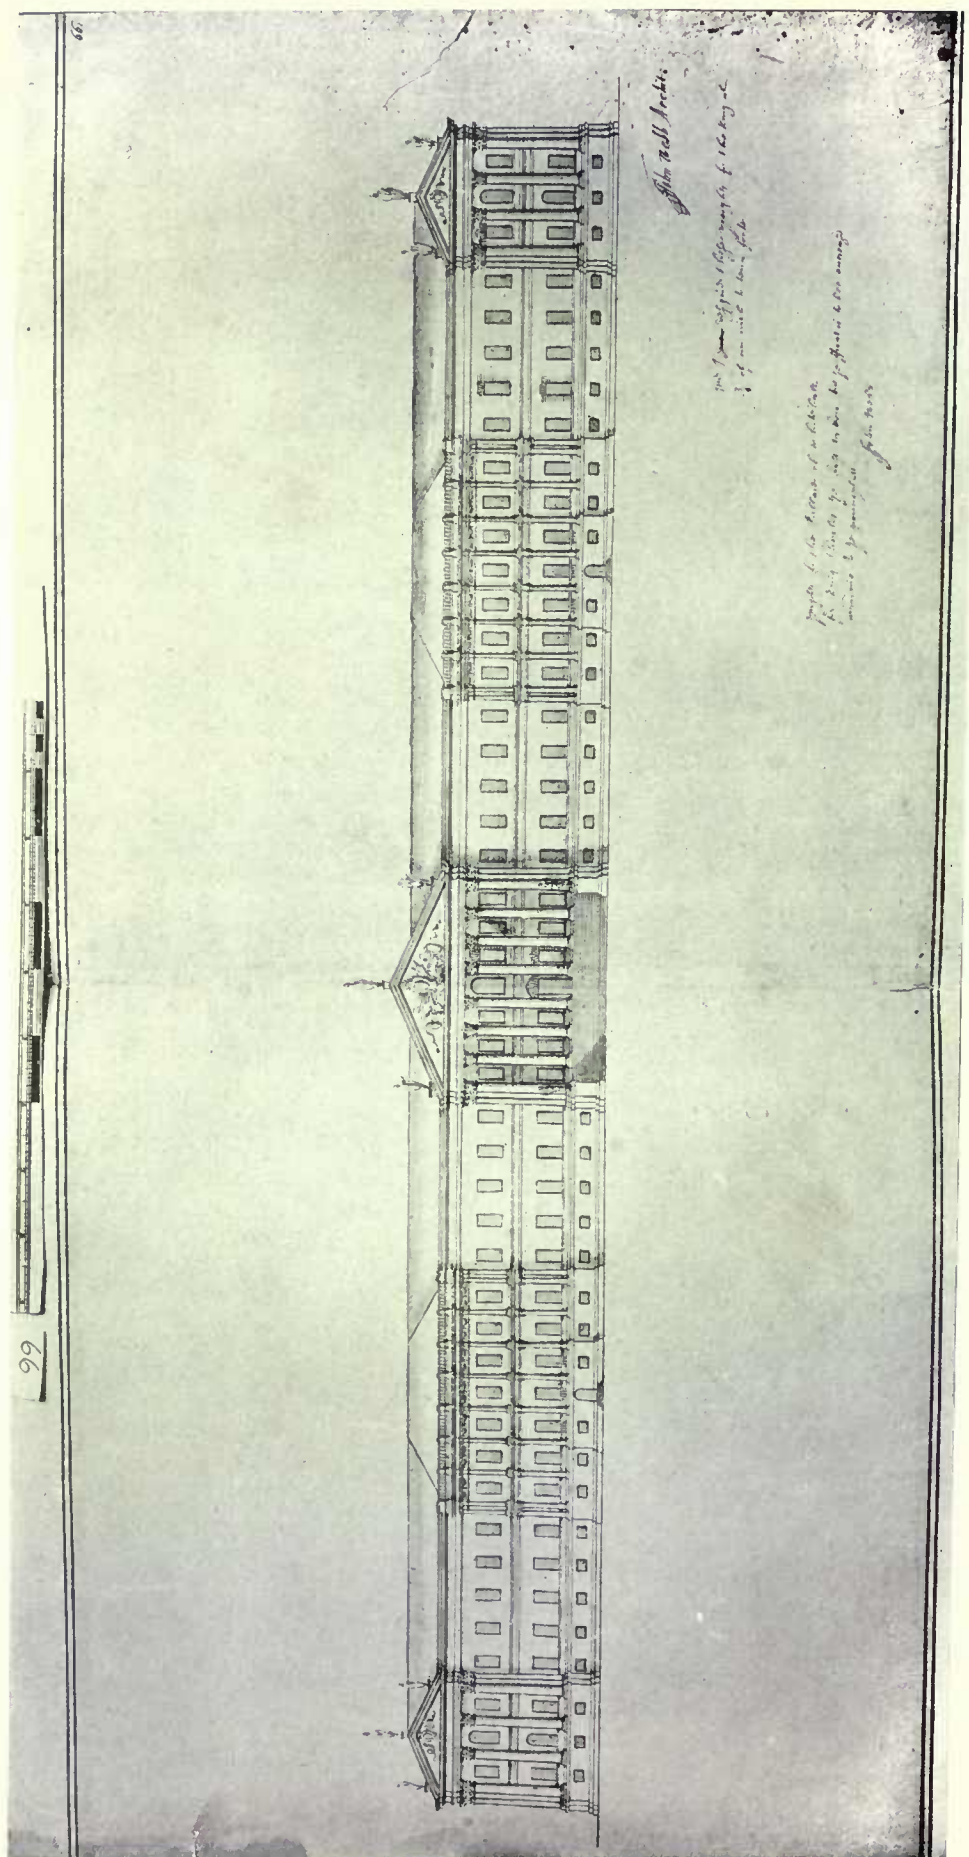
ELEVATION AGREEING WITH PLAN FIG. 16, SIGNED BY JOHN WEBB
